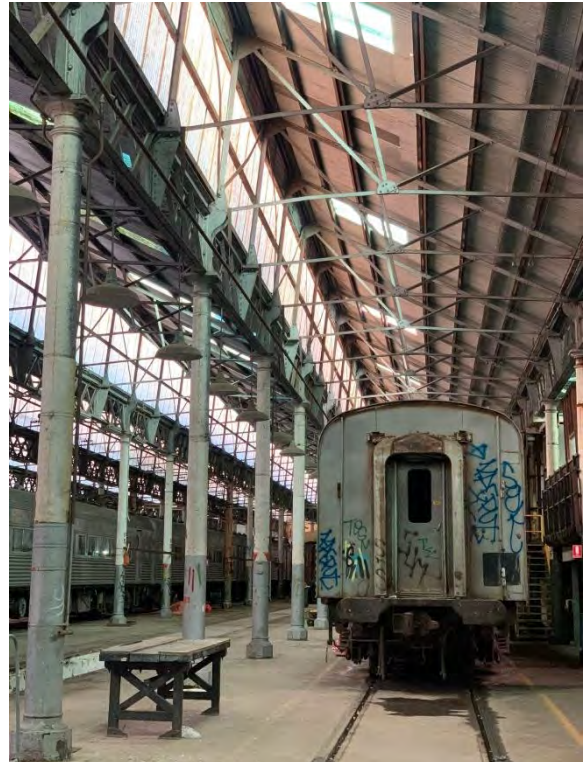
1920s Pendant lights remain suspended from central trusses between roads (Source: Curio 2021)
